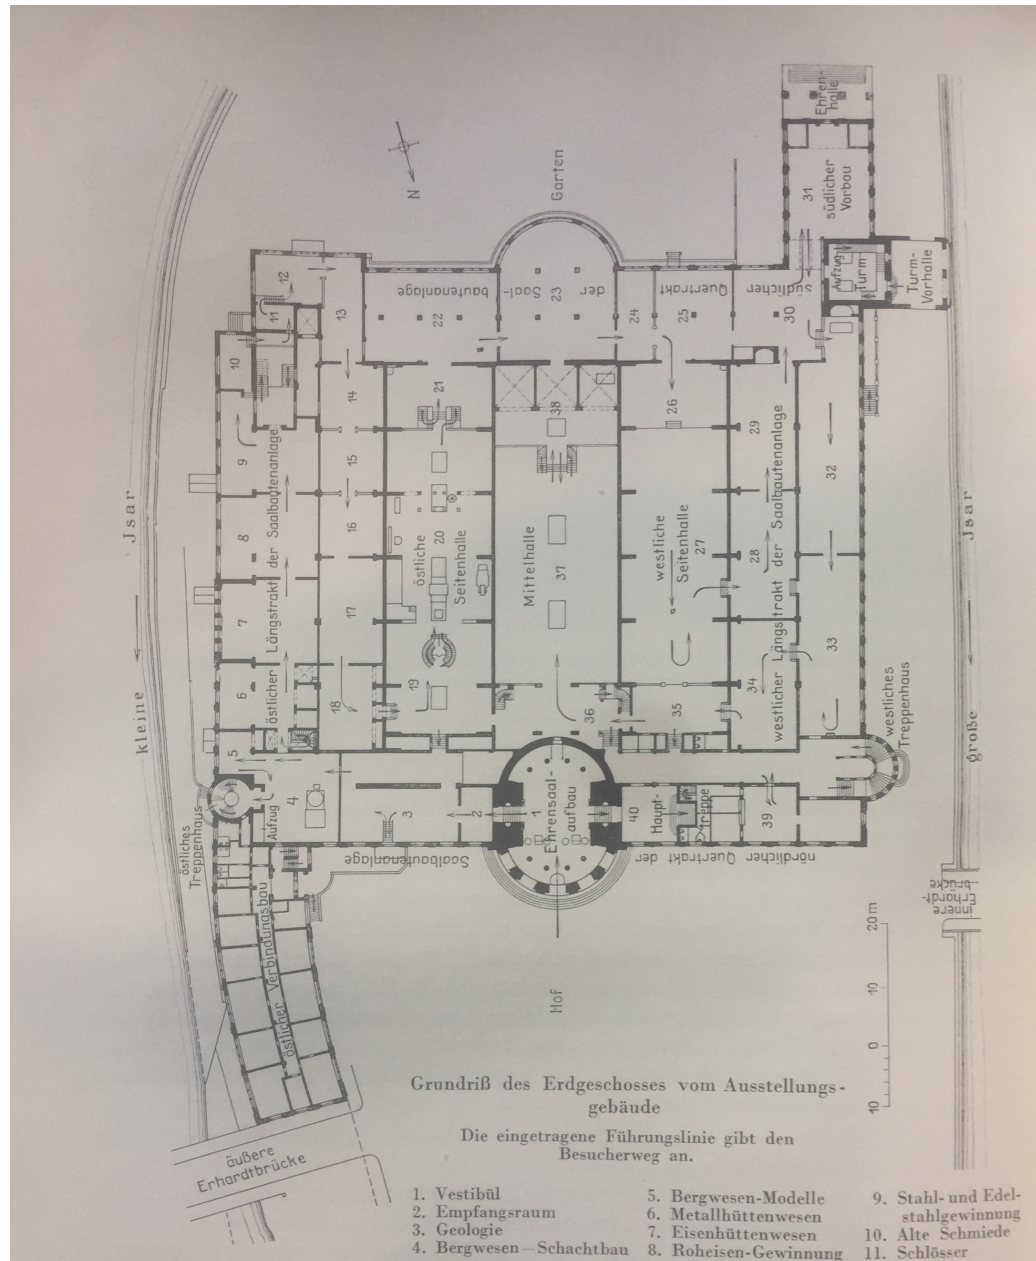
Seidl and von Miller's proposed ground floor floorplan. Courtesy Deutsches Museum Archives.
